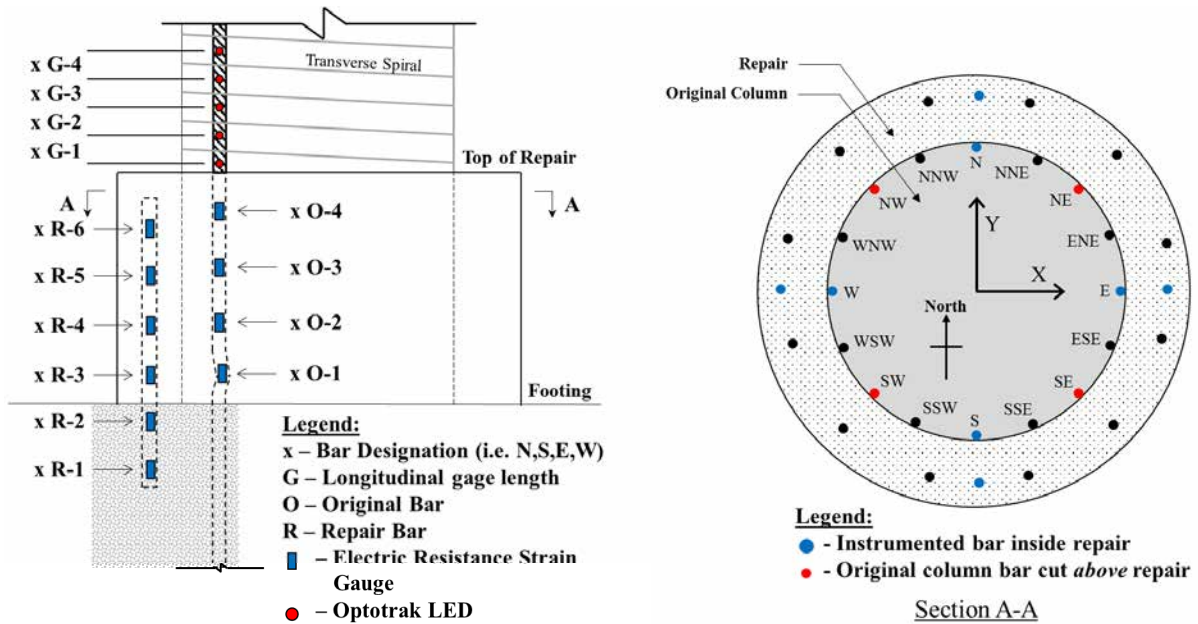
Repair #3 Instrumentation labels and repair cross section layout.
